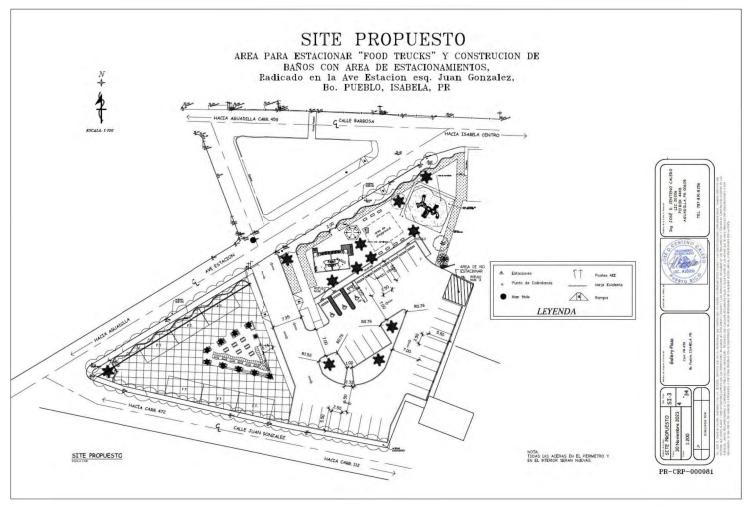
Poposed Site Plan, 13/October/2023 Set of Plans.
